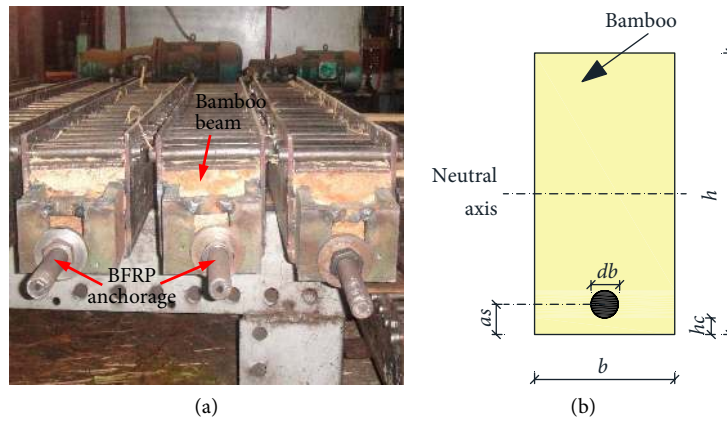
Sketch of completed specimens: (a) photo and (b) cross-section detail.
